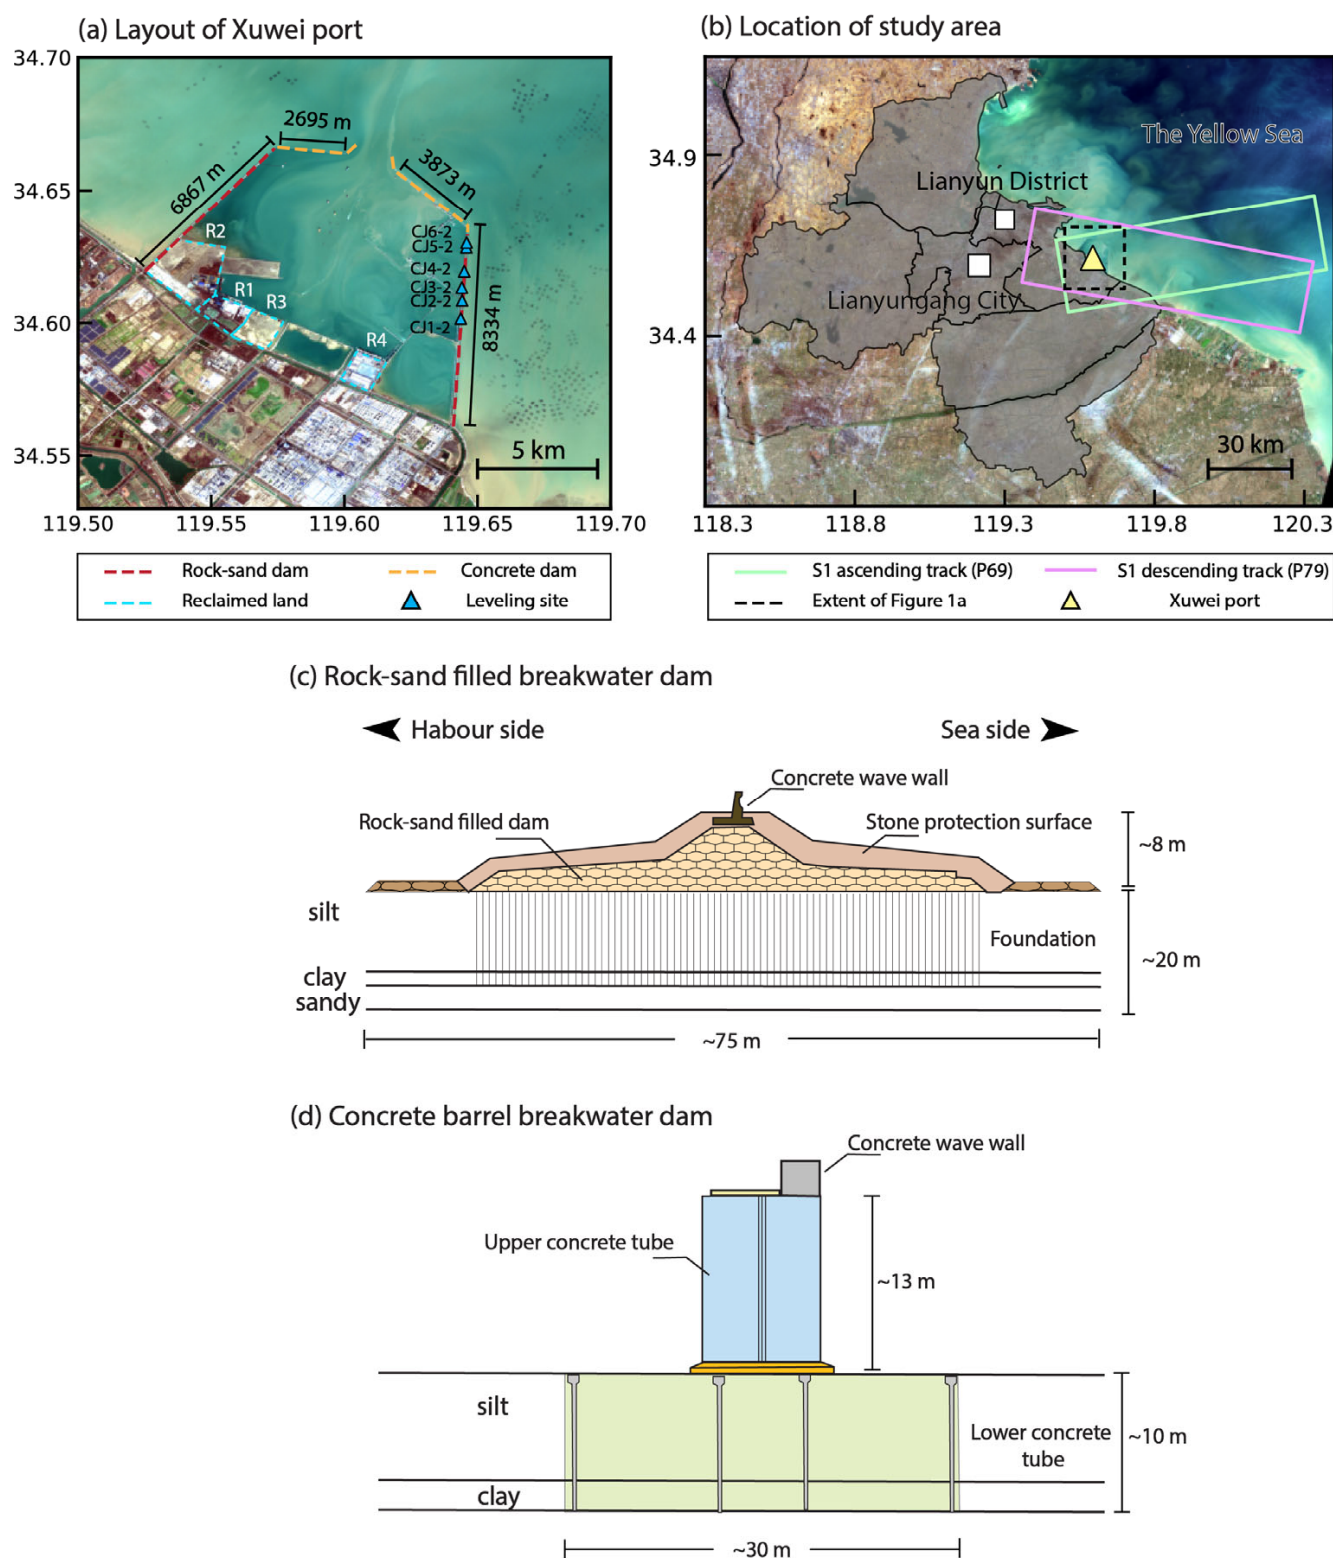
Study area and the layout of dams. (a) Layout of the dams in Xuwei Port. (b) Location of the study area and footprints of the Sentinel-1 data; (c,d) are structure profiles for rock-sand filled dam and concrete tubular dam.
